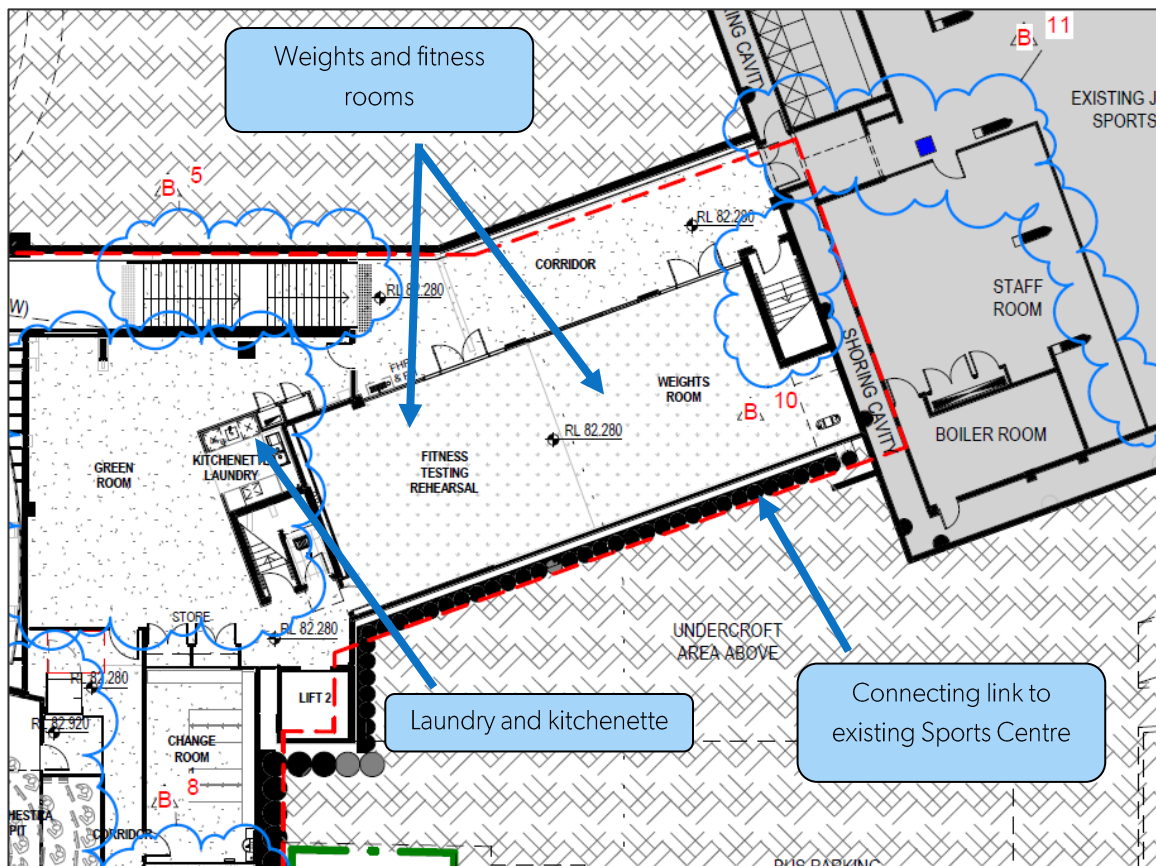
Approved RPAC floor plan level 3 (MOD1) (Source: Applicant's Modification Application 2017)
